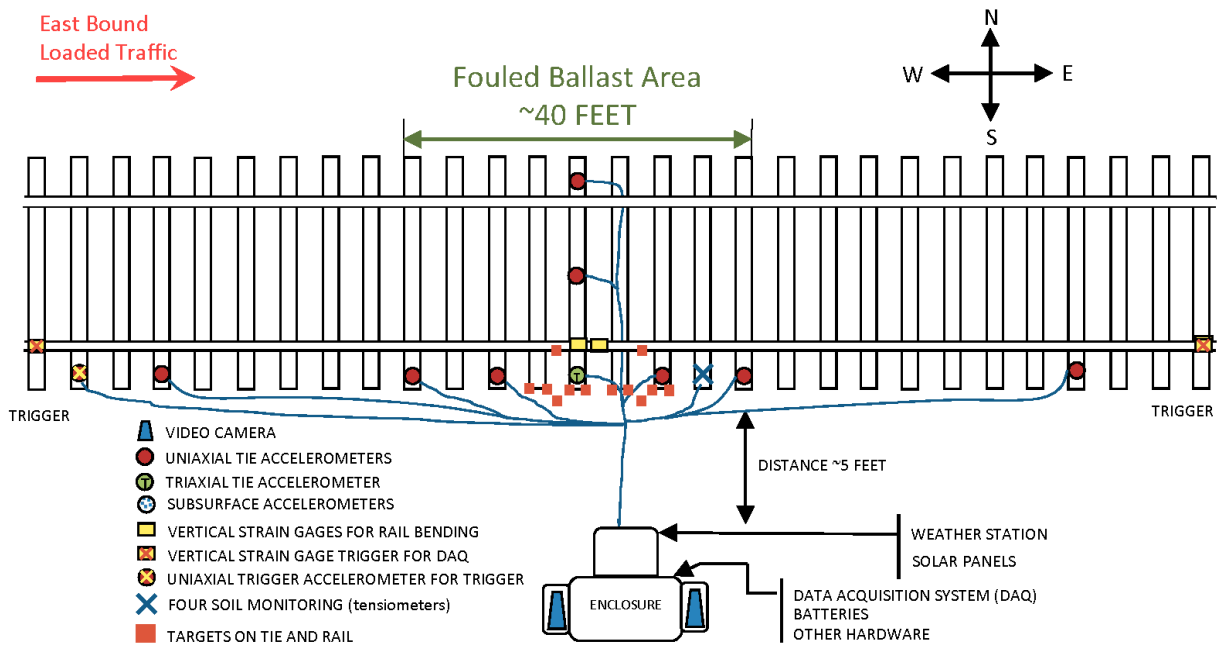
Plan View of Instrumentation at Concrete Tie Sites
